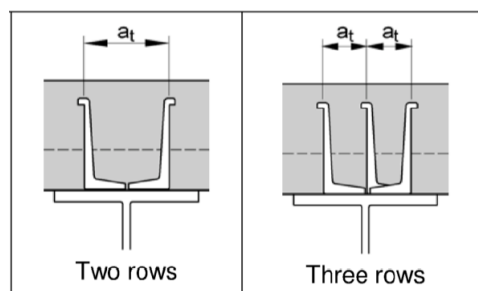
Spacing of connectors for slabs with transverse decking and connectors transverse to the beam (multiple rows).
